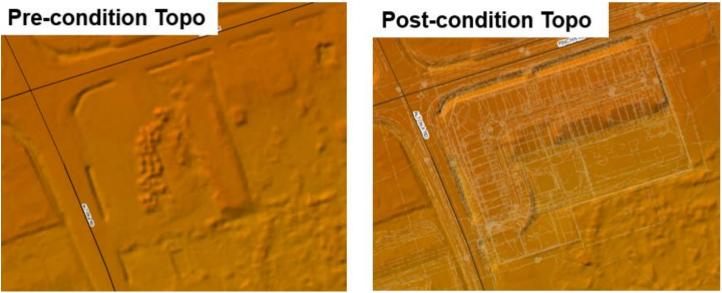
Location of 1999&1985 Altona Rd and CAD drawing with ground elevations
